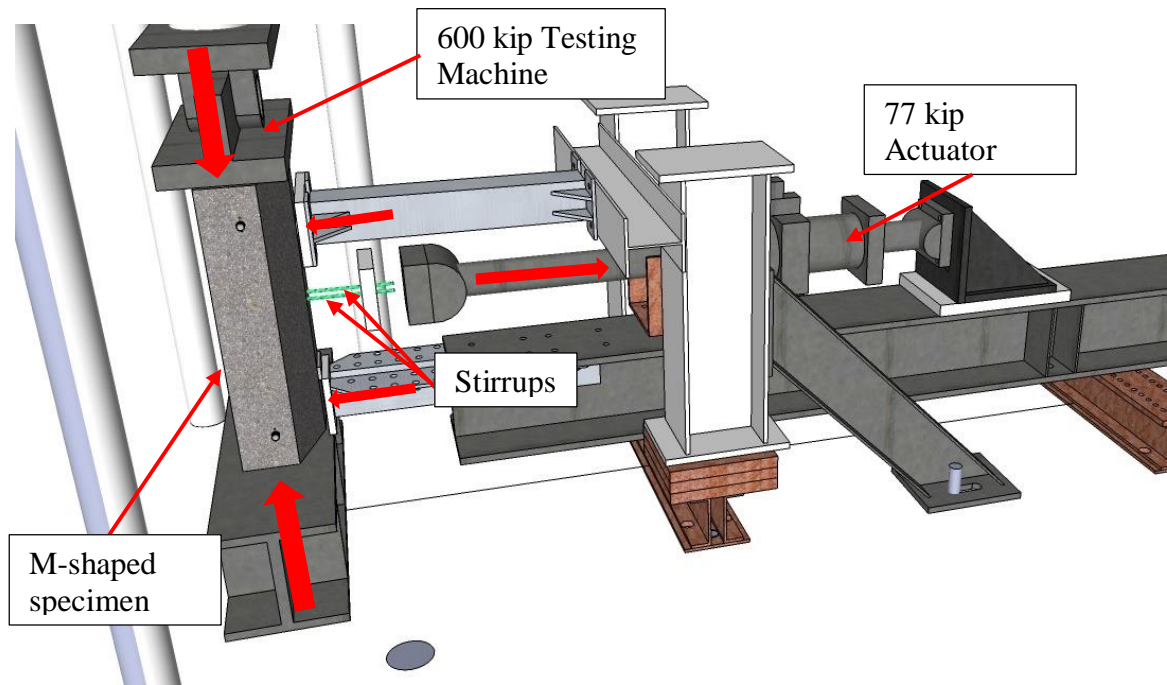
Overview of testing apparatus shown here for an M-shaped subassembly specimen
